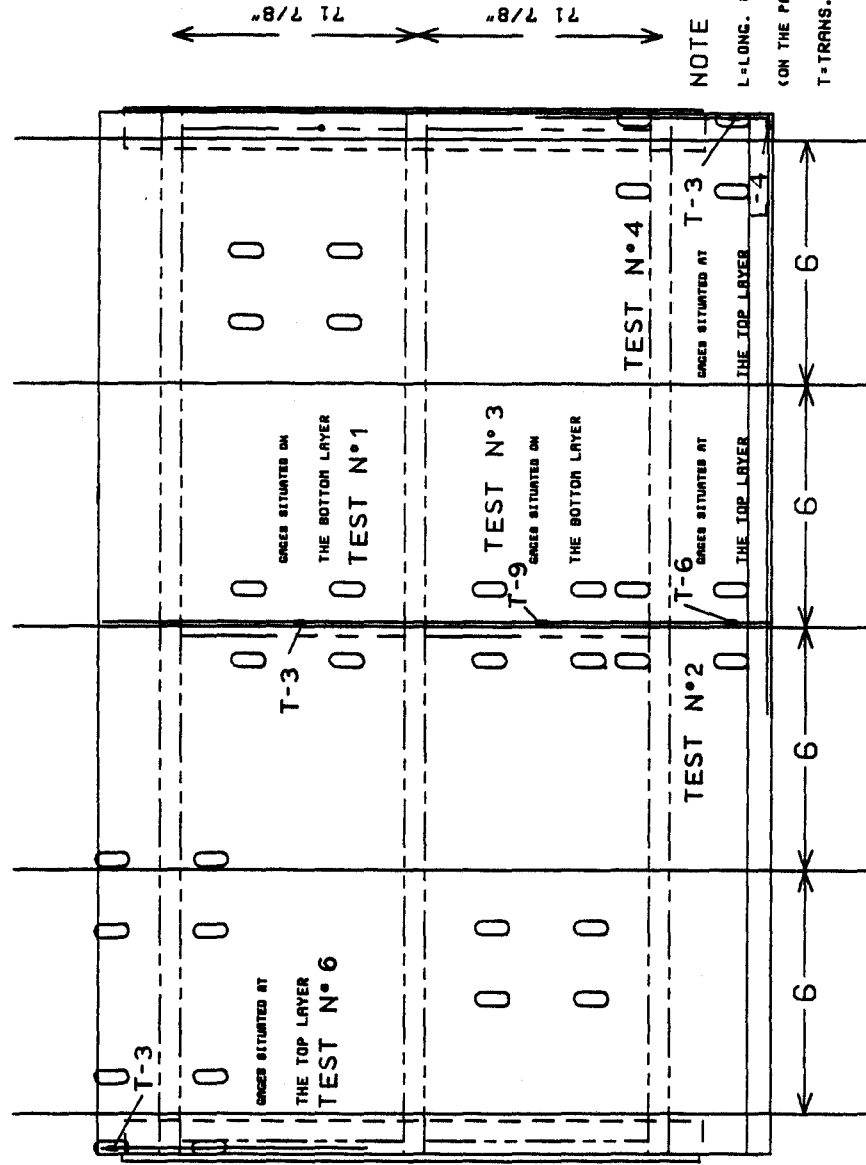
Reinforcement Steel Strain Gage Locations (Third Bridge)
